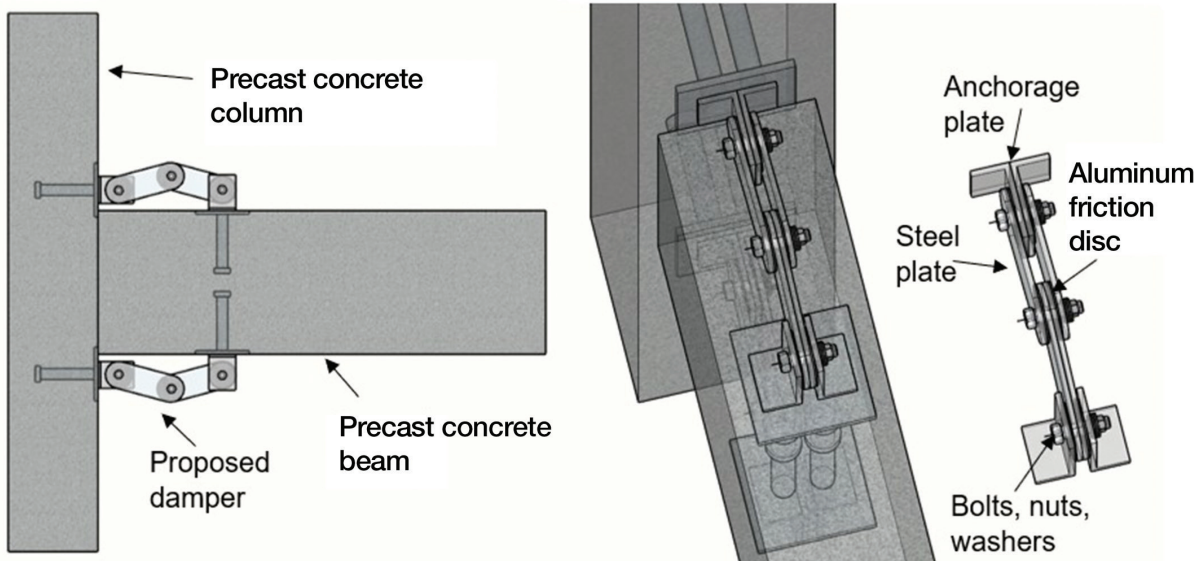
Three-dimensional rendering of the proposed damper mechanism installed on a precast concrete beam-column joint.
